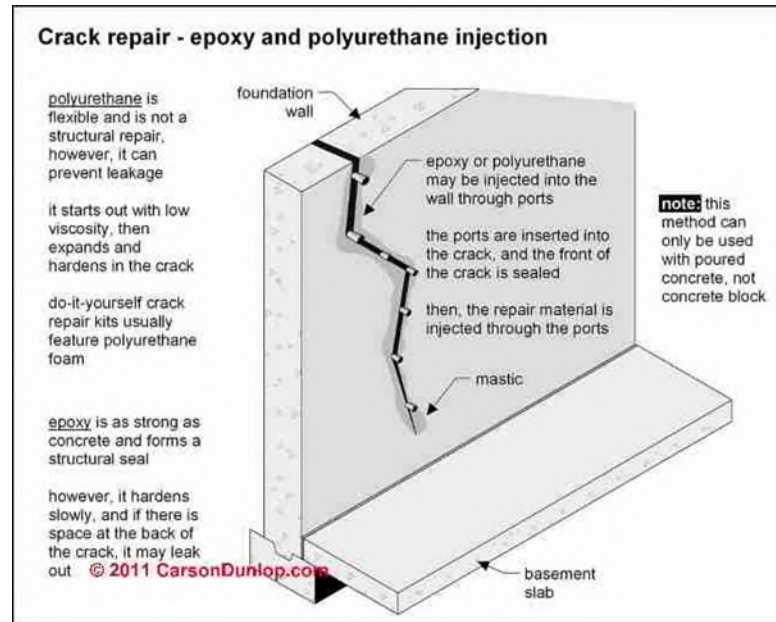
Repair of Concrete Crack in a Vertical Wall (Courtesy: Carson Dunlop)
